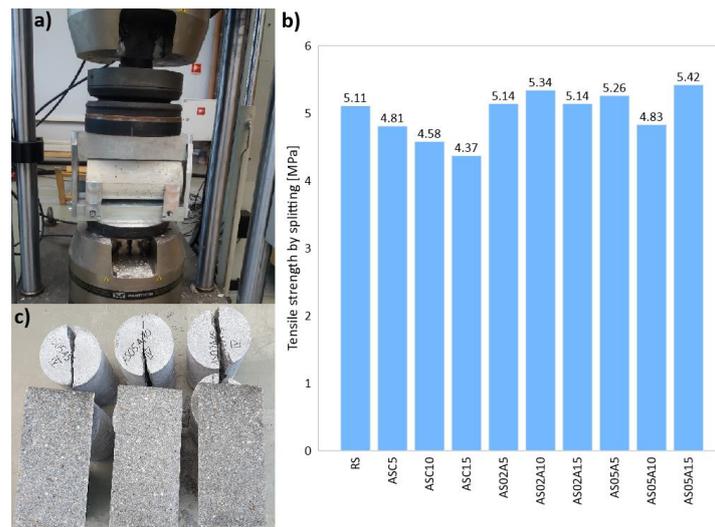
Tensile strength test by splitting: a) specimen during testing, b) average strength of tested specimens, c) specimens after failure
